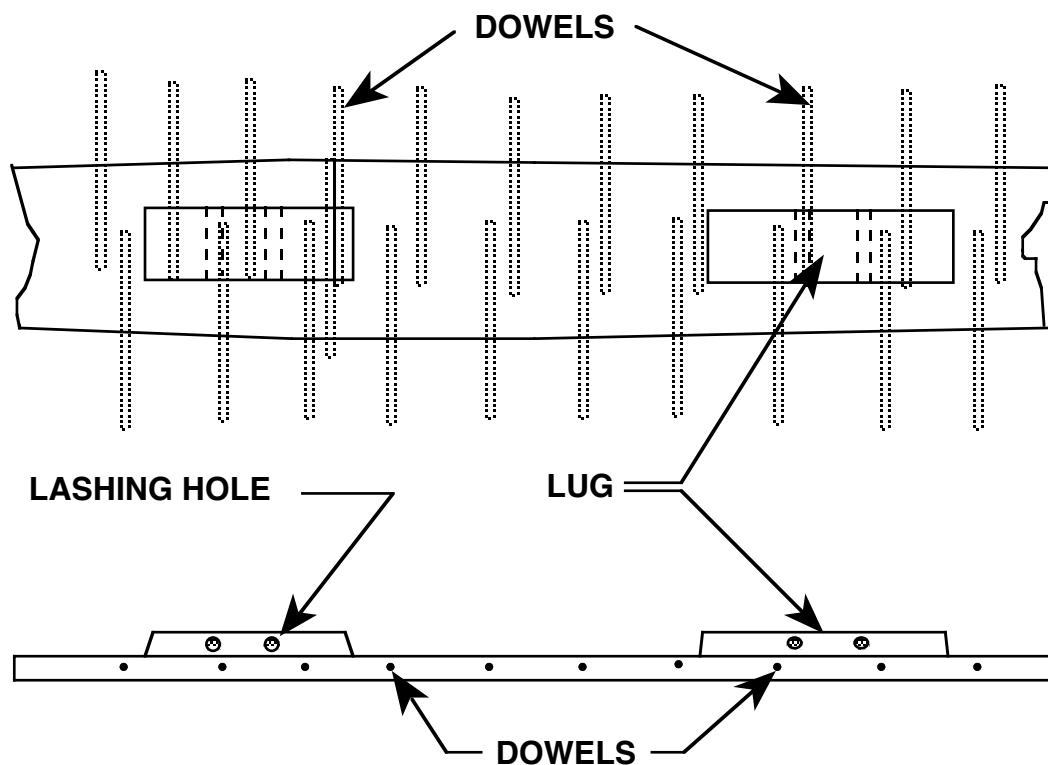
Plan showing the general arrangement of the dowels and lugs.
